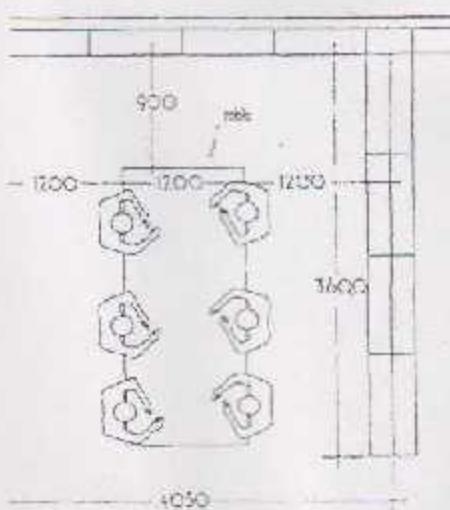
Recommended minima in open-access arranged as alcoves containing reading tables
